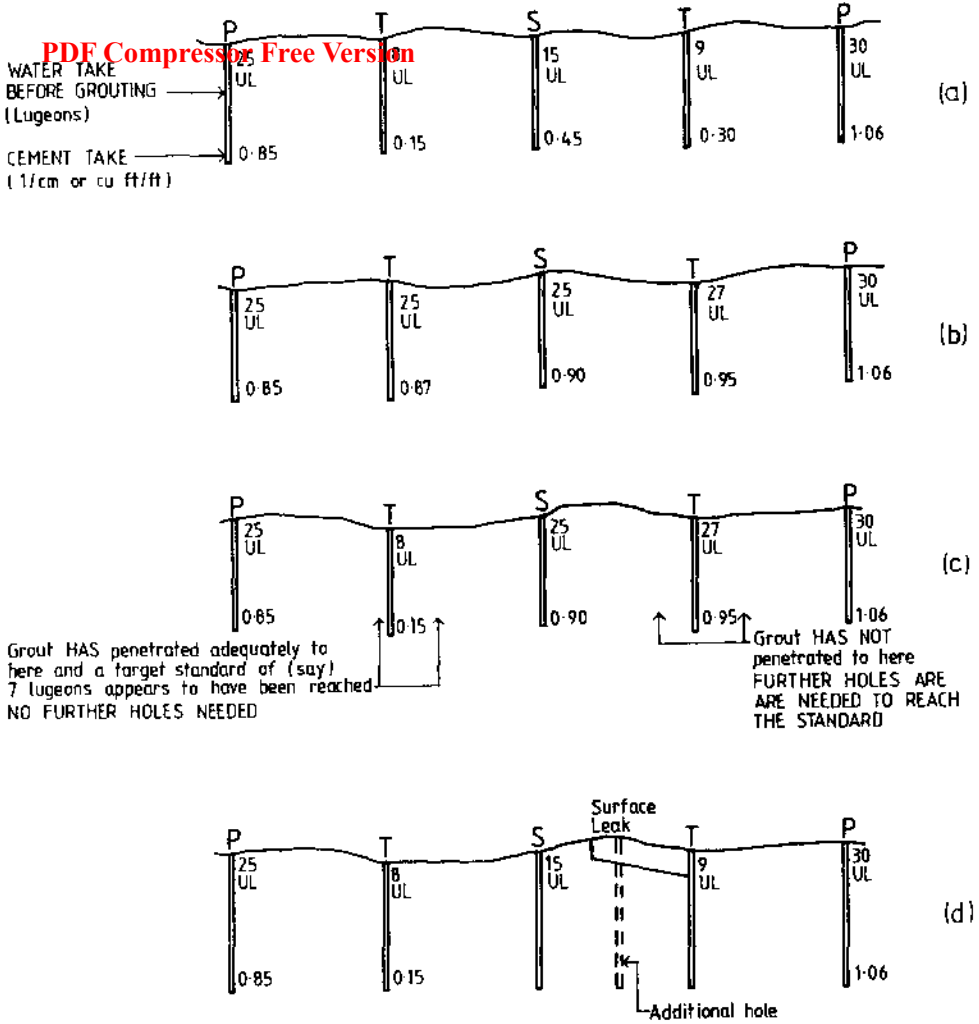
Examples of grout closure based on Lugeon water pressure test (and grout take as secondary information) – adapted from Houlsby (1977) and Water Resources Commission (1981).
